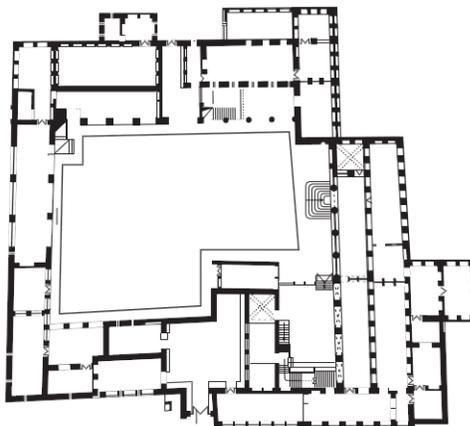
ground floor plan of Sheikh Saeed house. Source: Architecture of UAE (2006)
